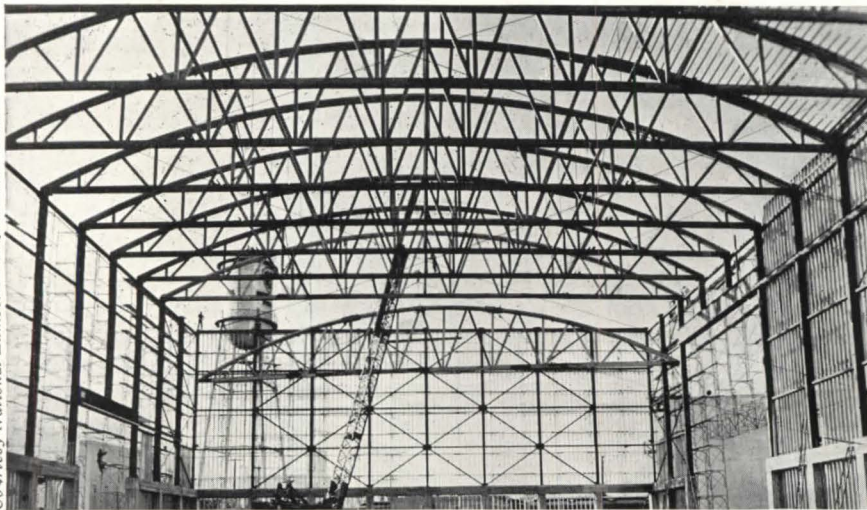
The Lamella-type roof truss distributes loads over the whole structure.
